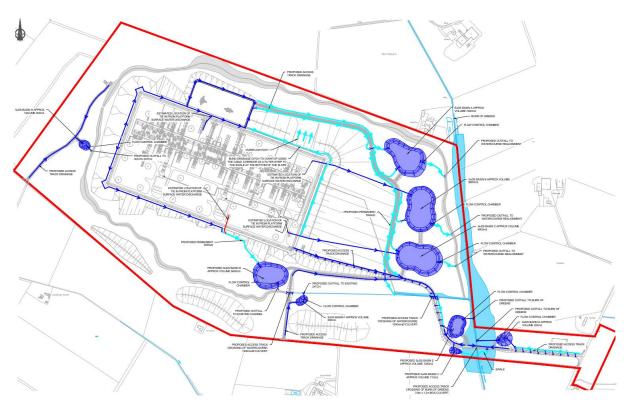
Greens 400kV Proposed Substation Drainage Layout
